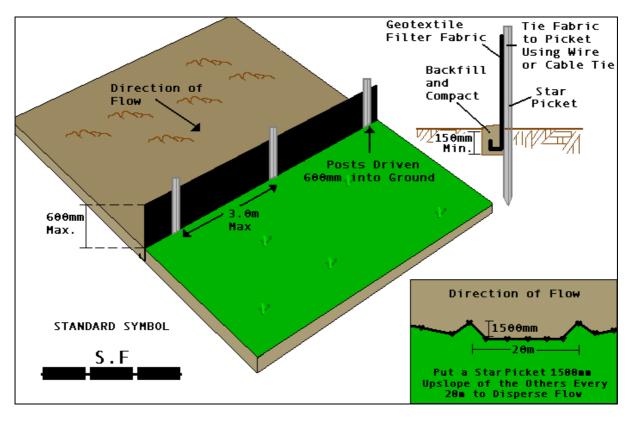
Silt Fence (VSAP Building Construction Sites Project Group, 2003)
